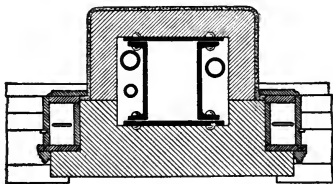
Fireproofing of Columns in Exterior Walls.
